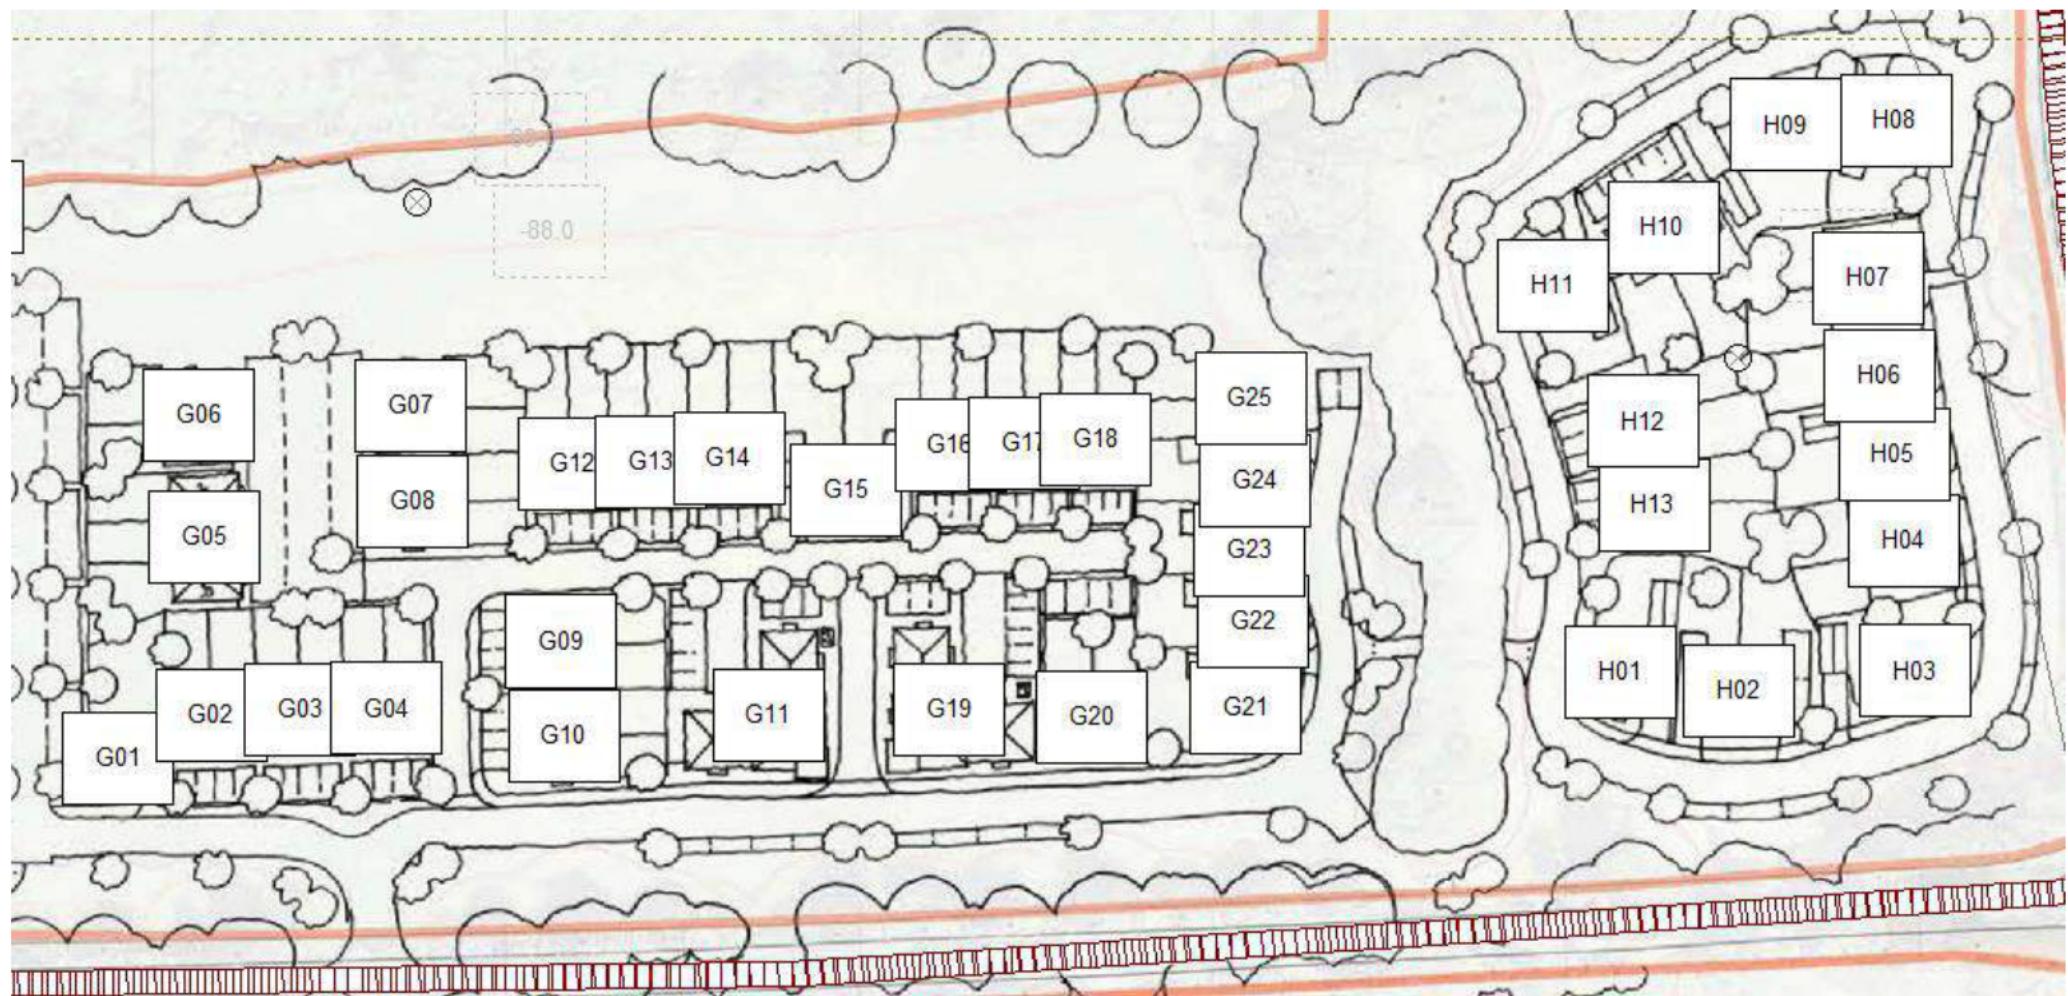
PLAN OF PROPOSED DEVELOPMENT AT PONDTAIL FARM – ASSESSMENT AREAS G & H
